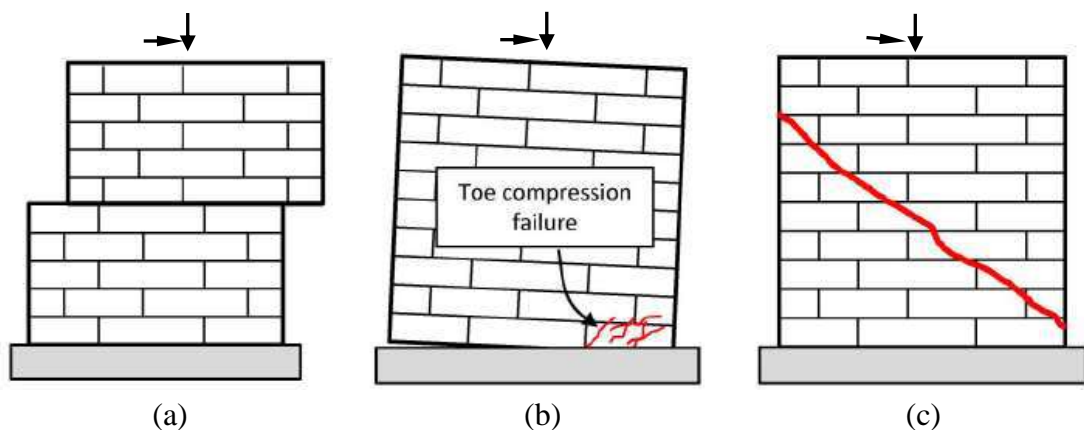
Failure mode of URM walls under In-plane load, (a) Sliding failure, (b) Rocking, (c) Diagonal cracking (Ghiassi et al., 2012)
